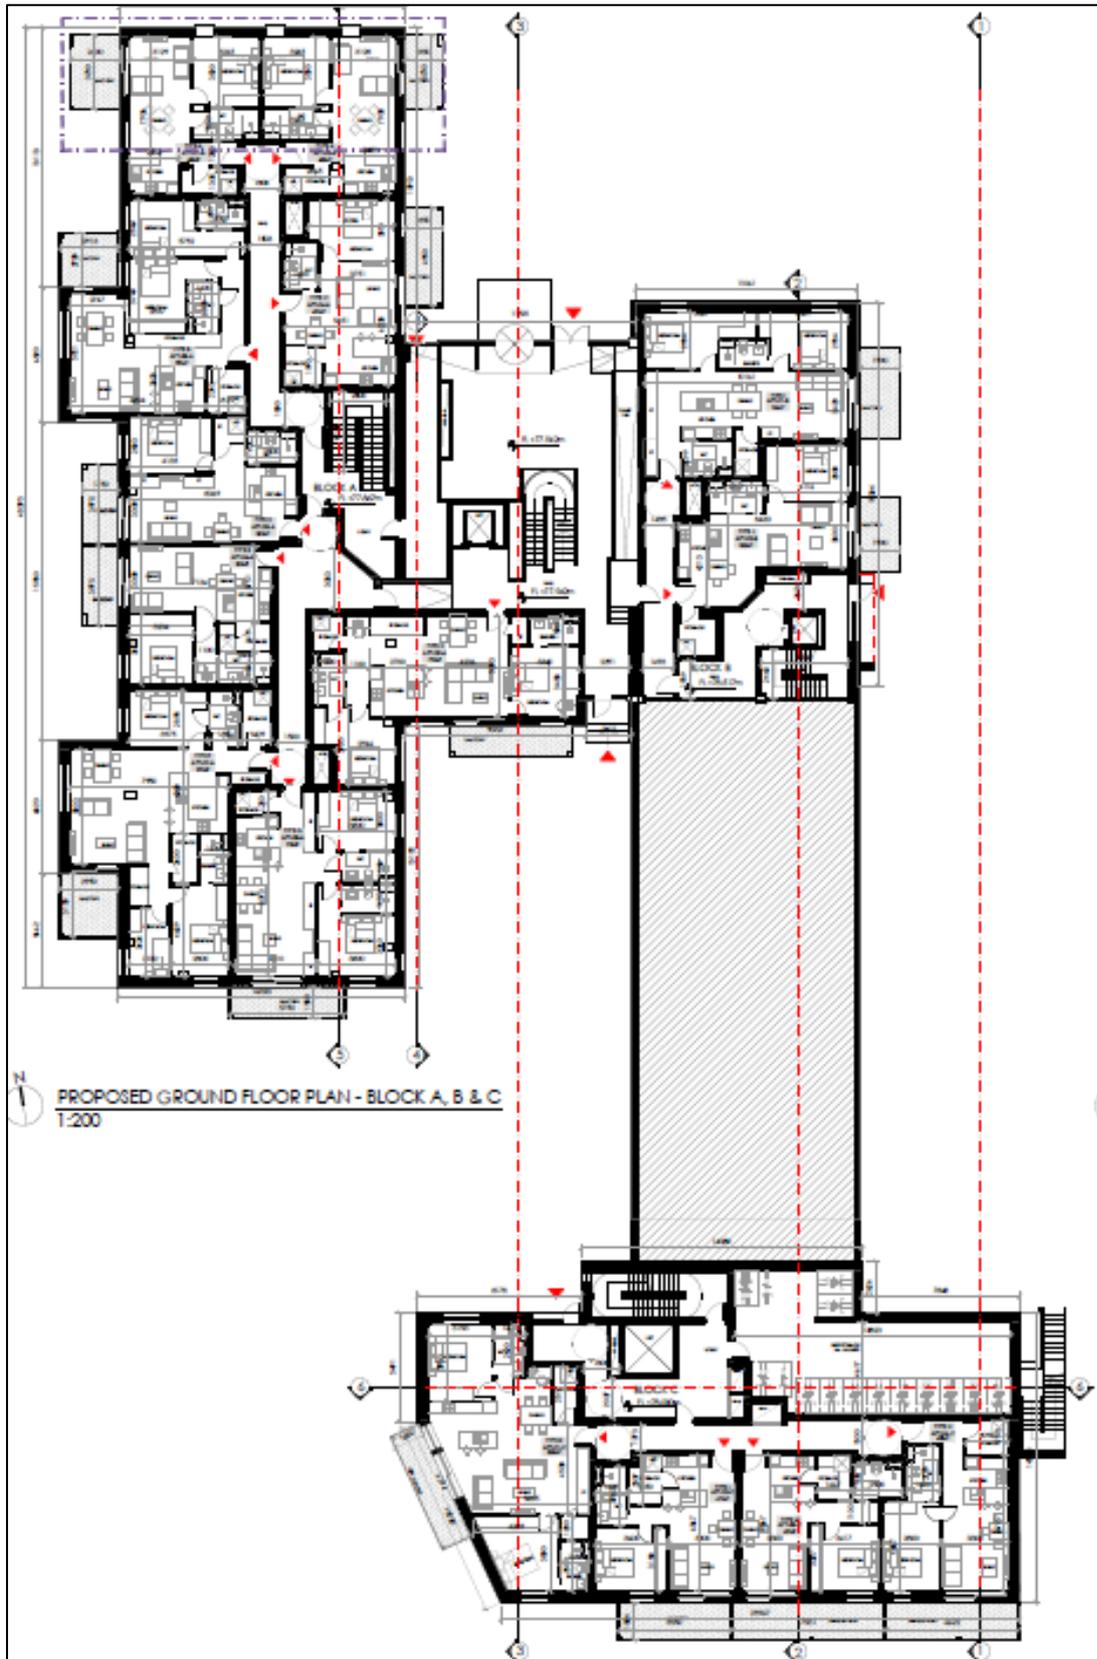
Ground floor plan of the proposed Blocks A, B and C
